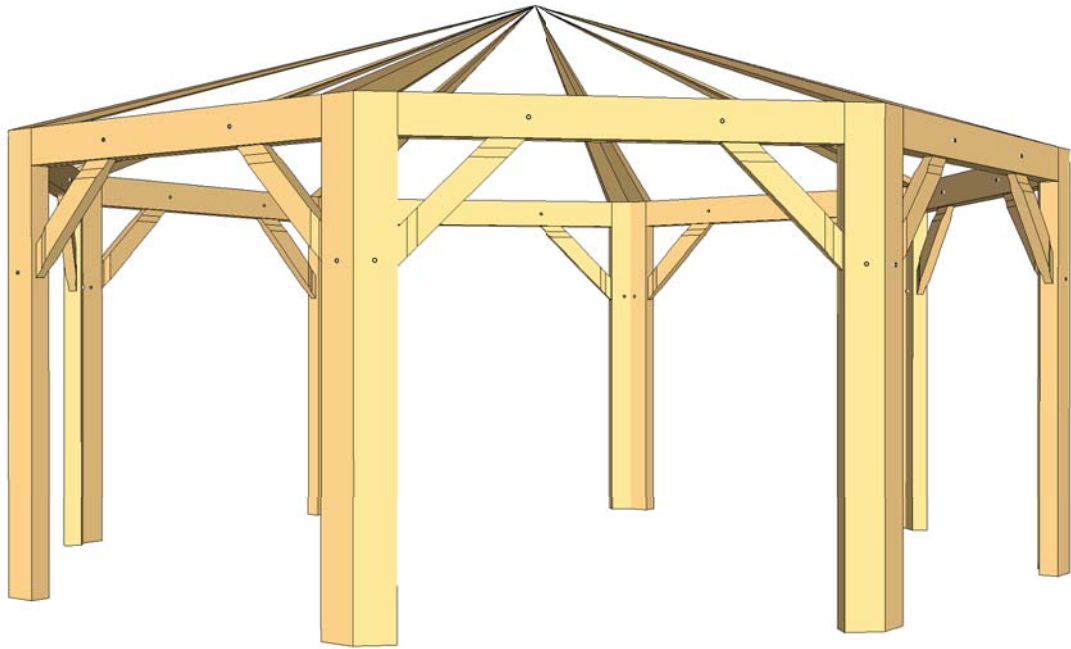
Timber frame implemented into an outdoor gazebo structure, rendered in SketchUp.
